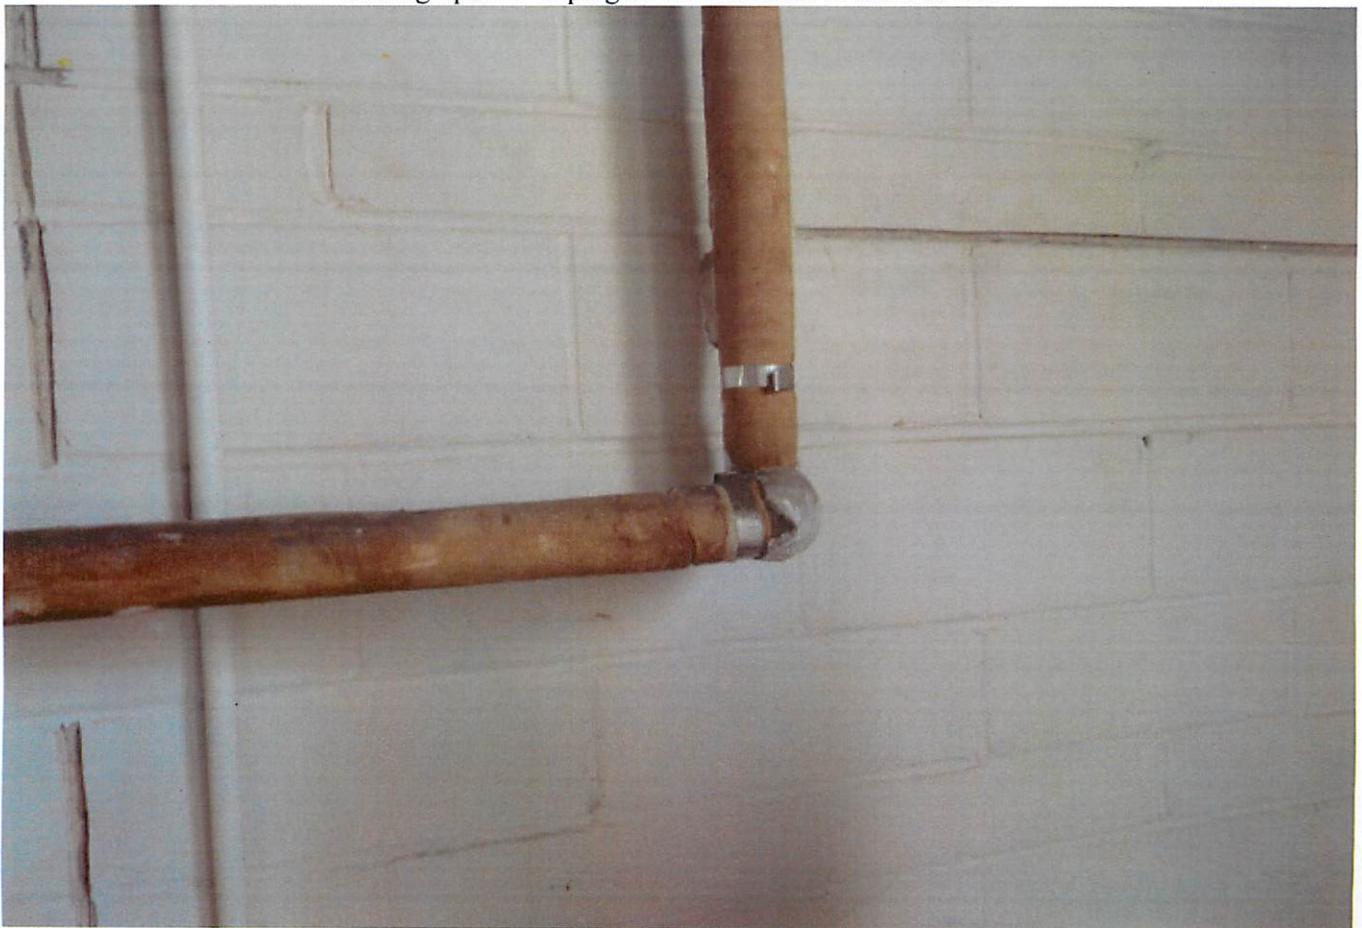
View of wall cracks on eastern wall of drill hall
